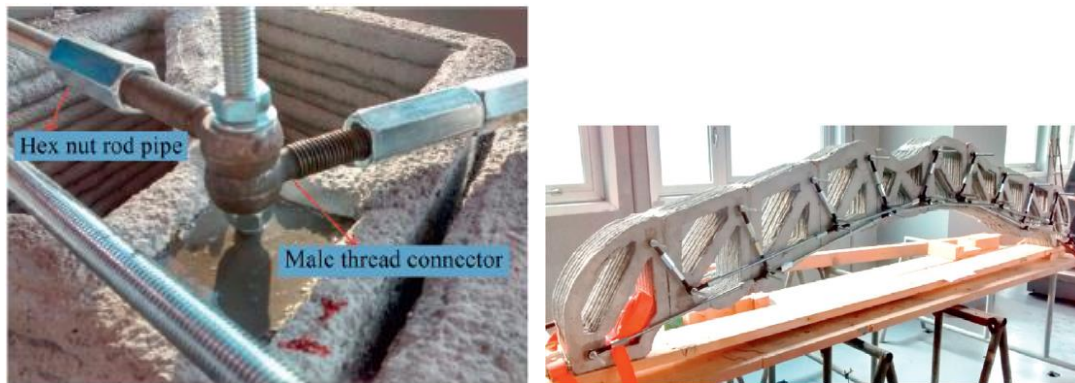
and 6 – On the left external steel reinforcement connection details and on the right variable cross-section RC beams obtained through the DFC technique of external reinforcement arrangement.
